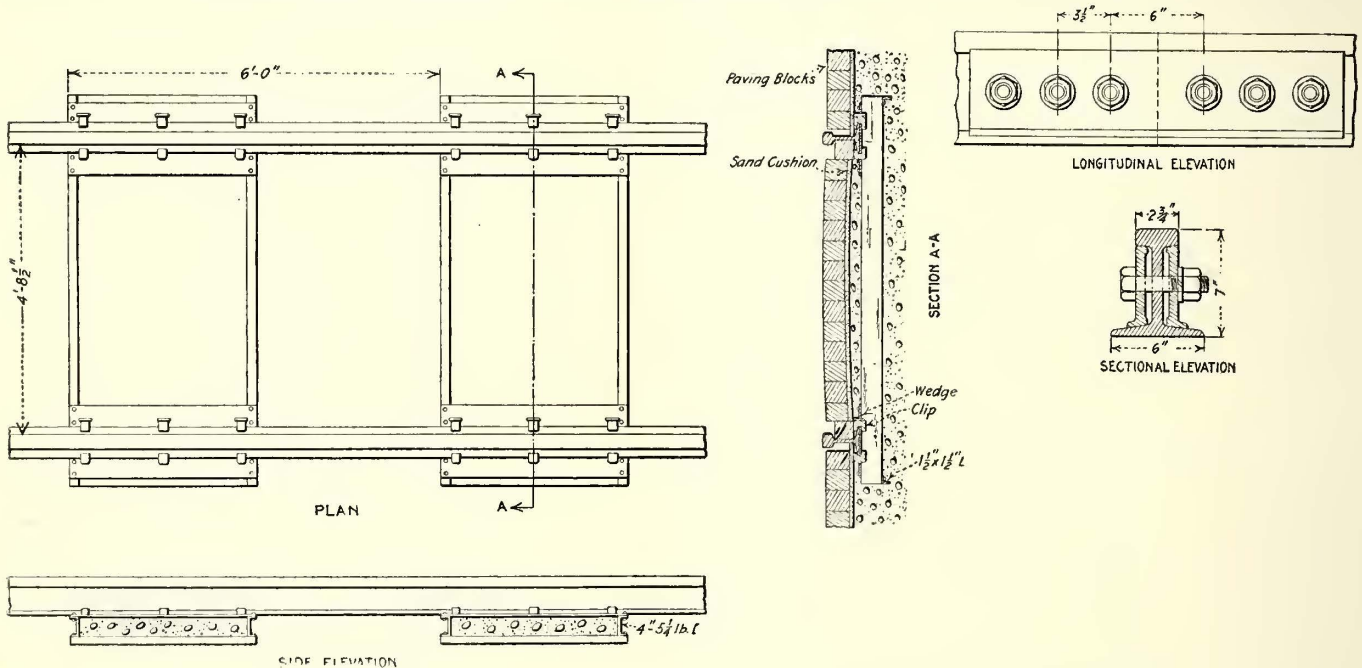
Track Construction and Maintenance—Sections and Plan of City T-Rail Construction; Also Details of Joint
